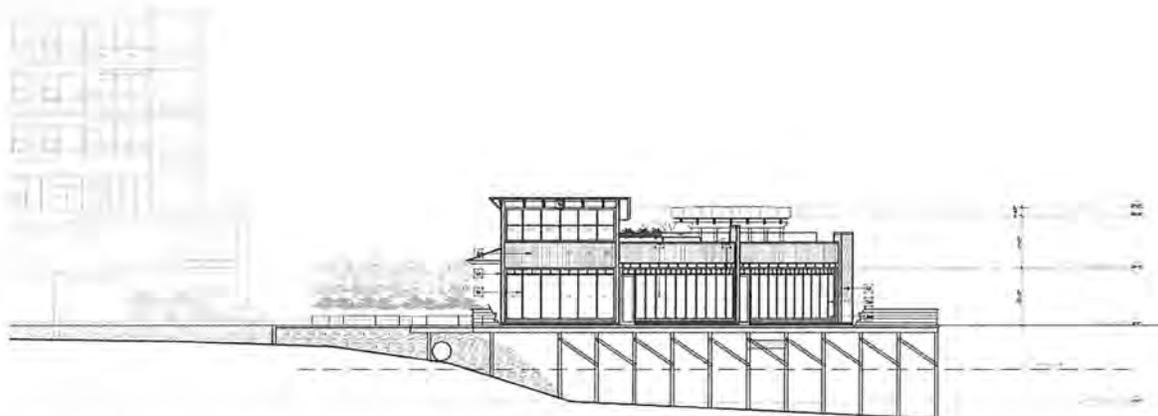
View of waterfront restaurant south elevation (drawing A9.0.6)
